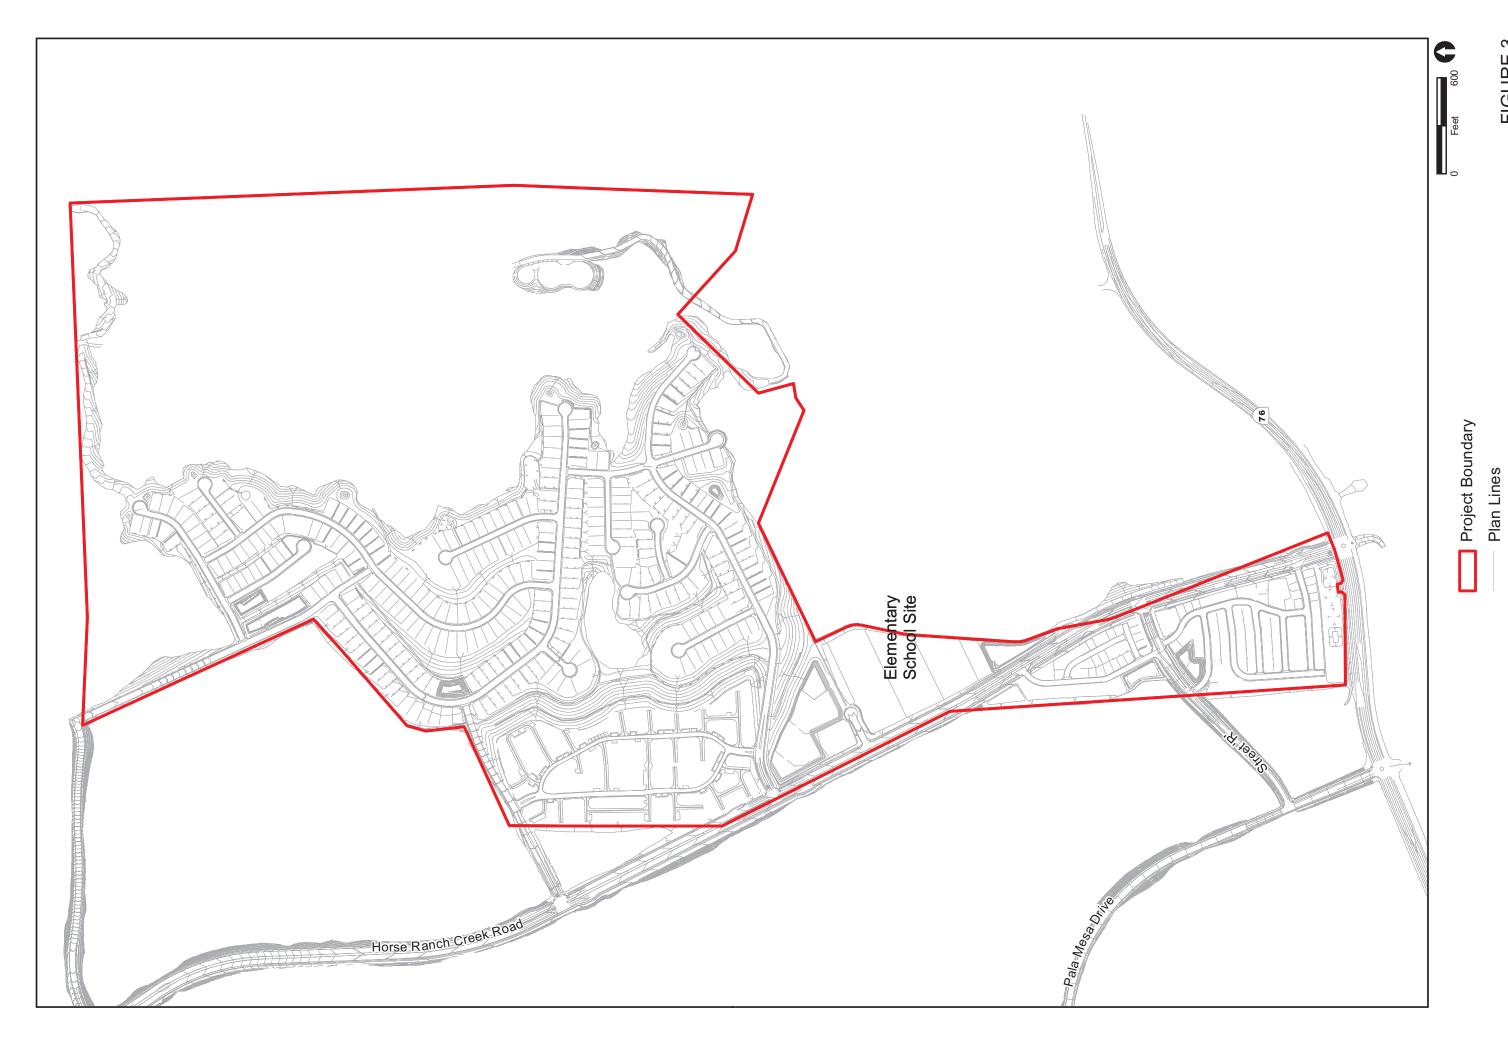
Site Plan Even with the construction of barriers, exterior noise levels above the ground floor levels could exceed 60 CNEL at the multi-family buildings. Therefore, at such time as architectural plans are available, and prior to the issuance of building permits, an interior acoustical analysis shall be conducted for the multi-family units detailed in the Mitigation section below. If interior allowable noise levels are met by requiring that windows be unopenable or closed, the design for the structure must also specify a ventilation or airconditioning system to provide a habitable interior environment, as specified in the State Building Code.
